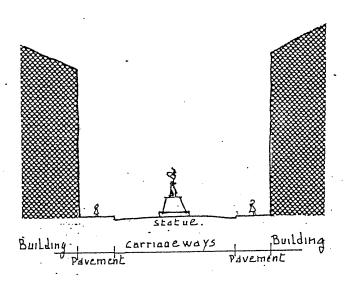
Cross-Section of the crossing street. scale 1/5,00.
